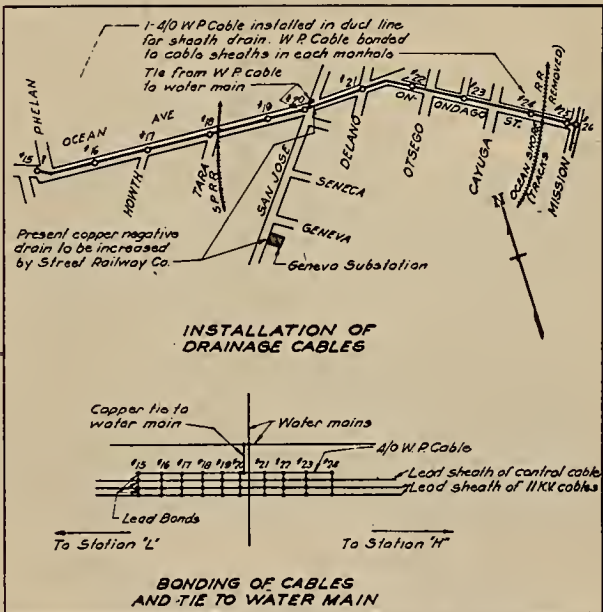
Sketch showing installation of drainage cables, bonding of cables and tie to water main.
